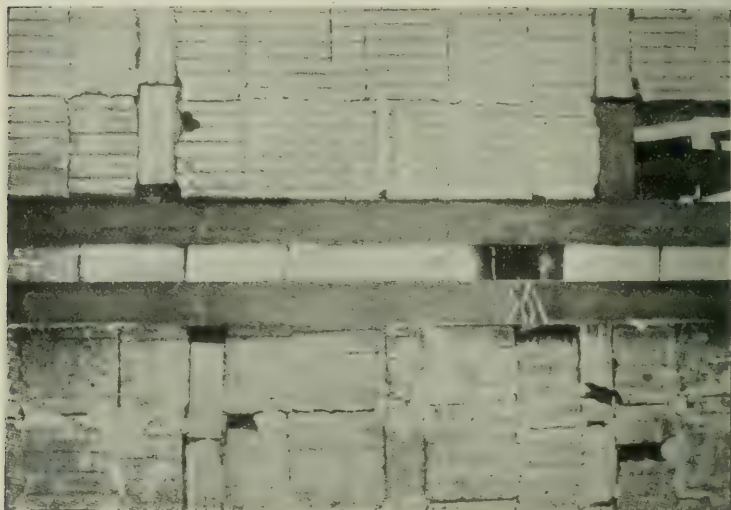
Defective Workmanship Destroying the Protection of Steel Girder with Clay Tile.
